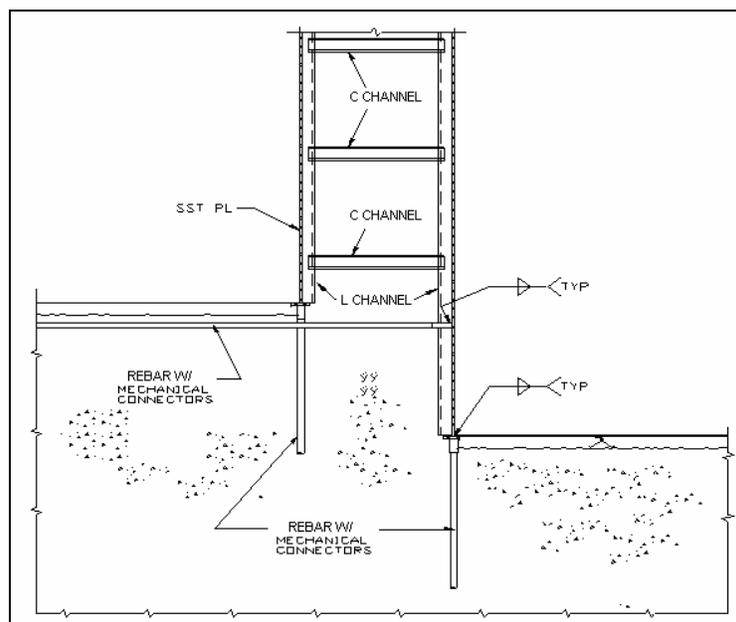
Typical Base Detail for AP1000 Wall Modules
